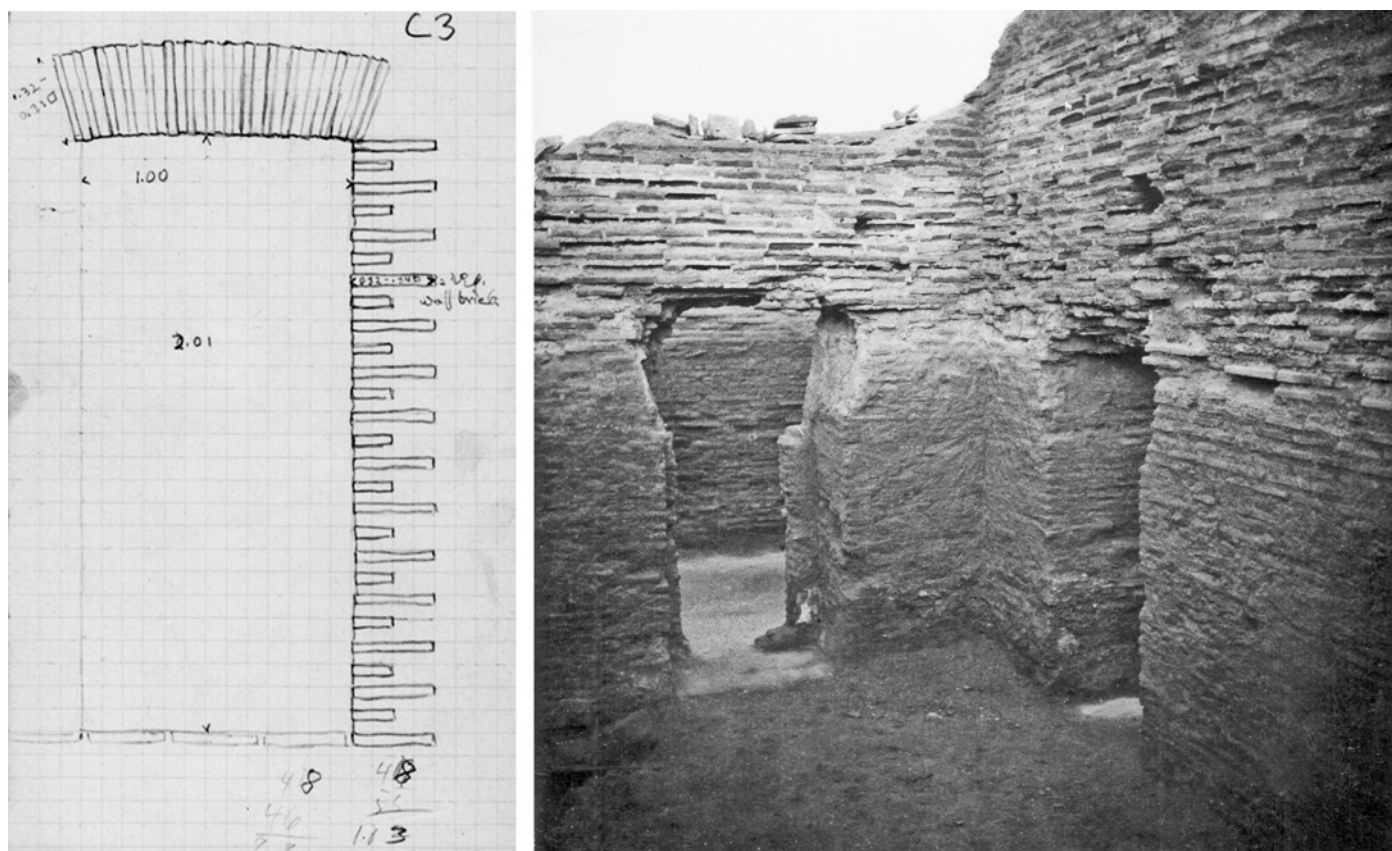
R, C3 bath Room 2 looking E to door to 1 and (R) 3; note removal of bricks of the flat door arches. L, archive sketch of original dimensions of one of the doors.
